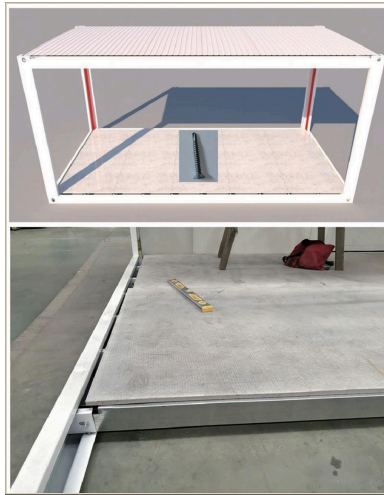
Cement boards laid onto the secondary beams and fixed with 4.2 × 38 mm floor nails — board edges supported on every beam.
